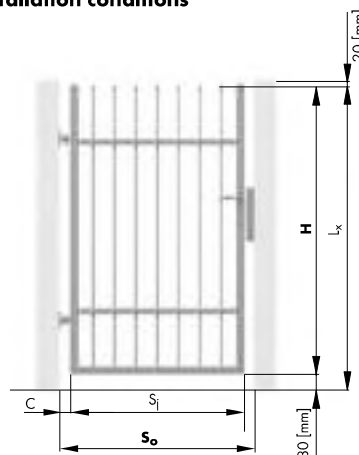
The assembly dimensions and their marking required for correct selection and assembly of the wicket - view from the premises side.
